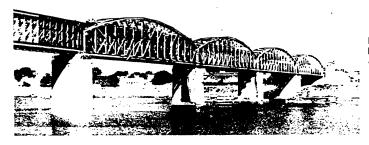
Malaviya Bridge. Railhighway structure over the Ganges at Benares (C)
